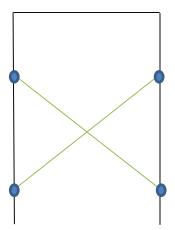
Bracing elements between columns (The effects of imperfections, n.d)
